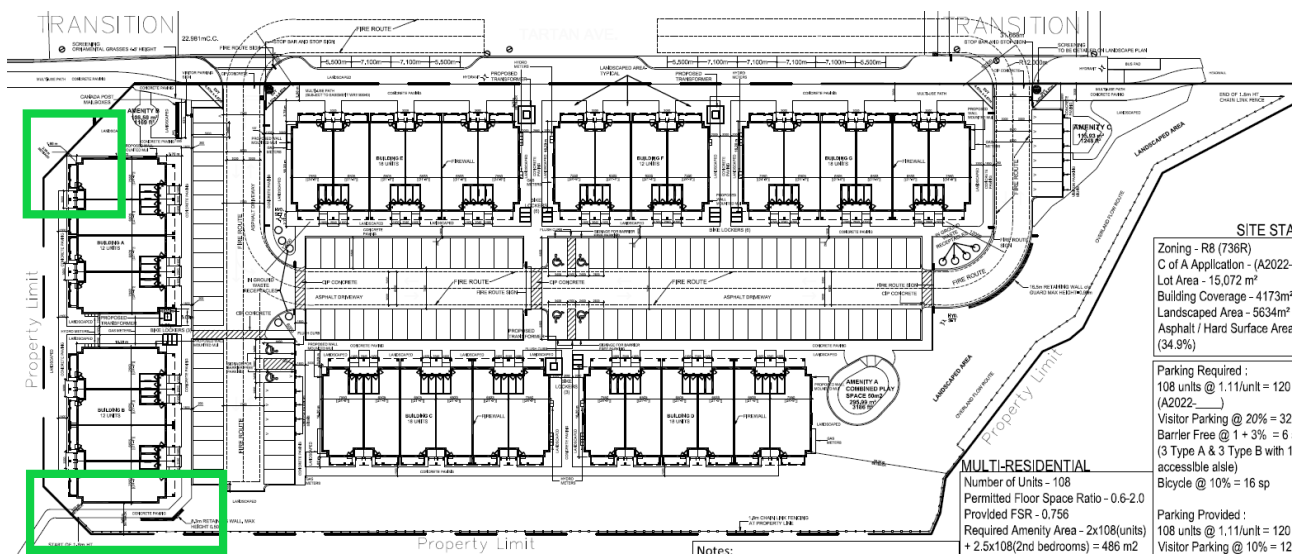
Site Plan: Green box indicating reduced rear and side yard
